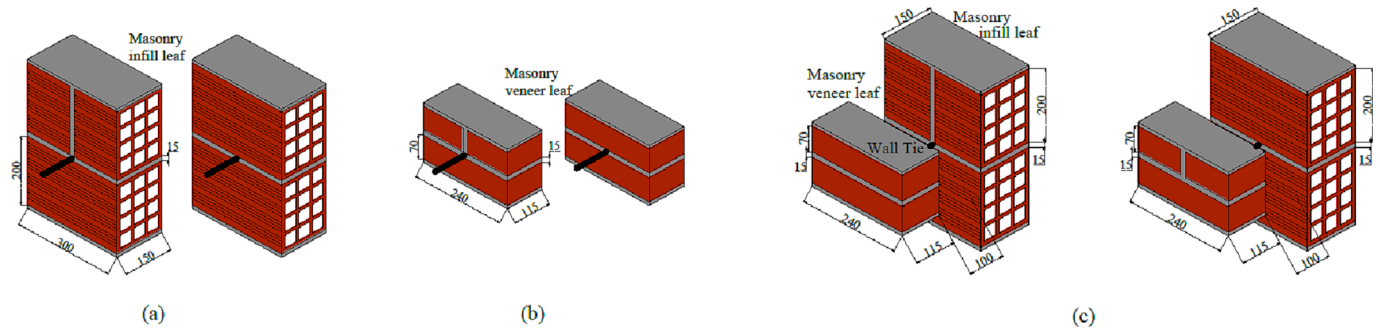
Test specimens: (a) brick masonry infill with embedded tie; (b) brick masonry veneer with embedded tie; (c) complete assemblage of brick masonry prisms connected [22].
